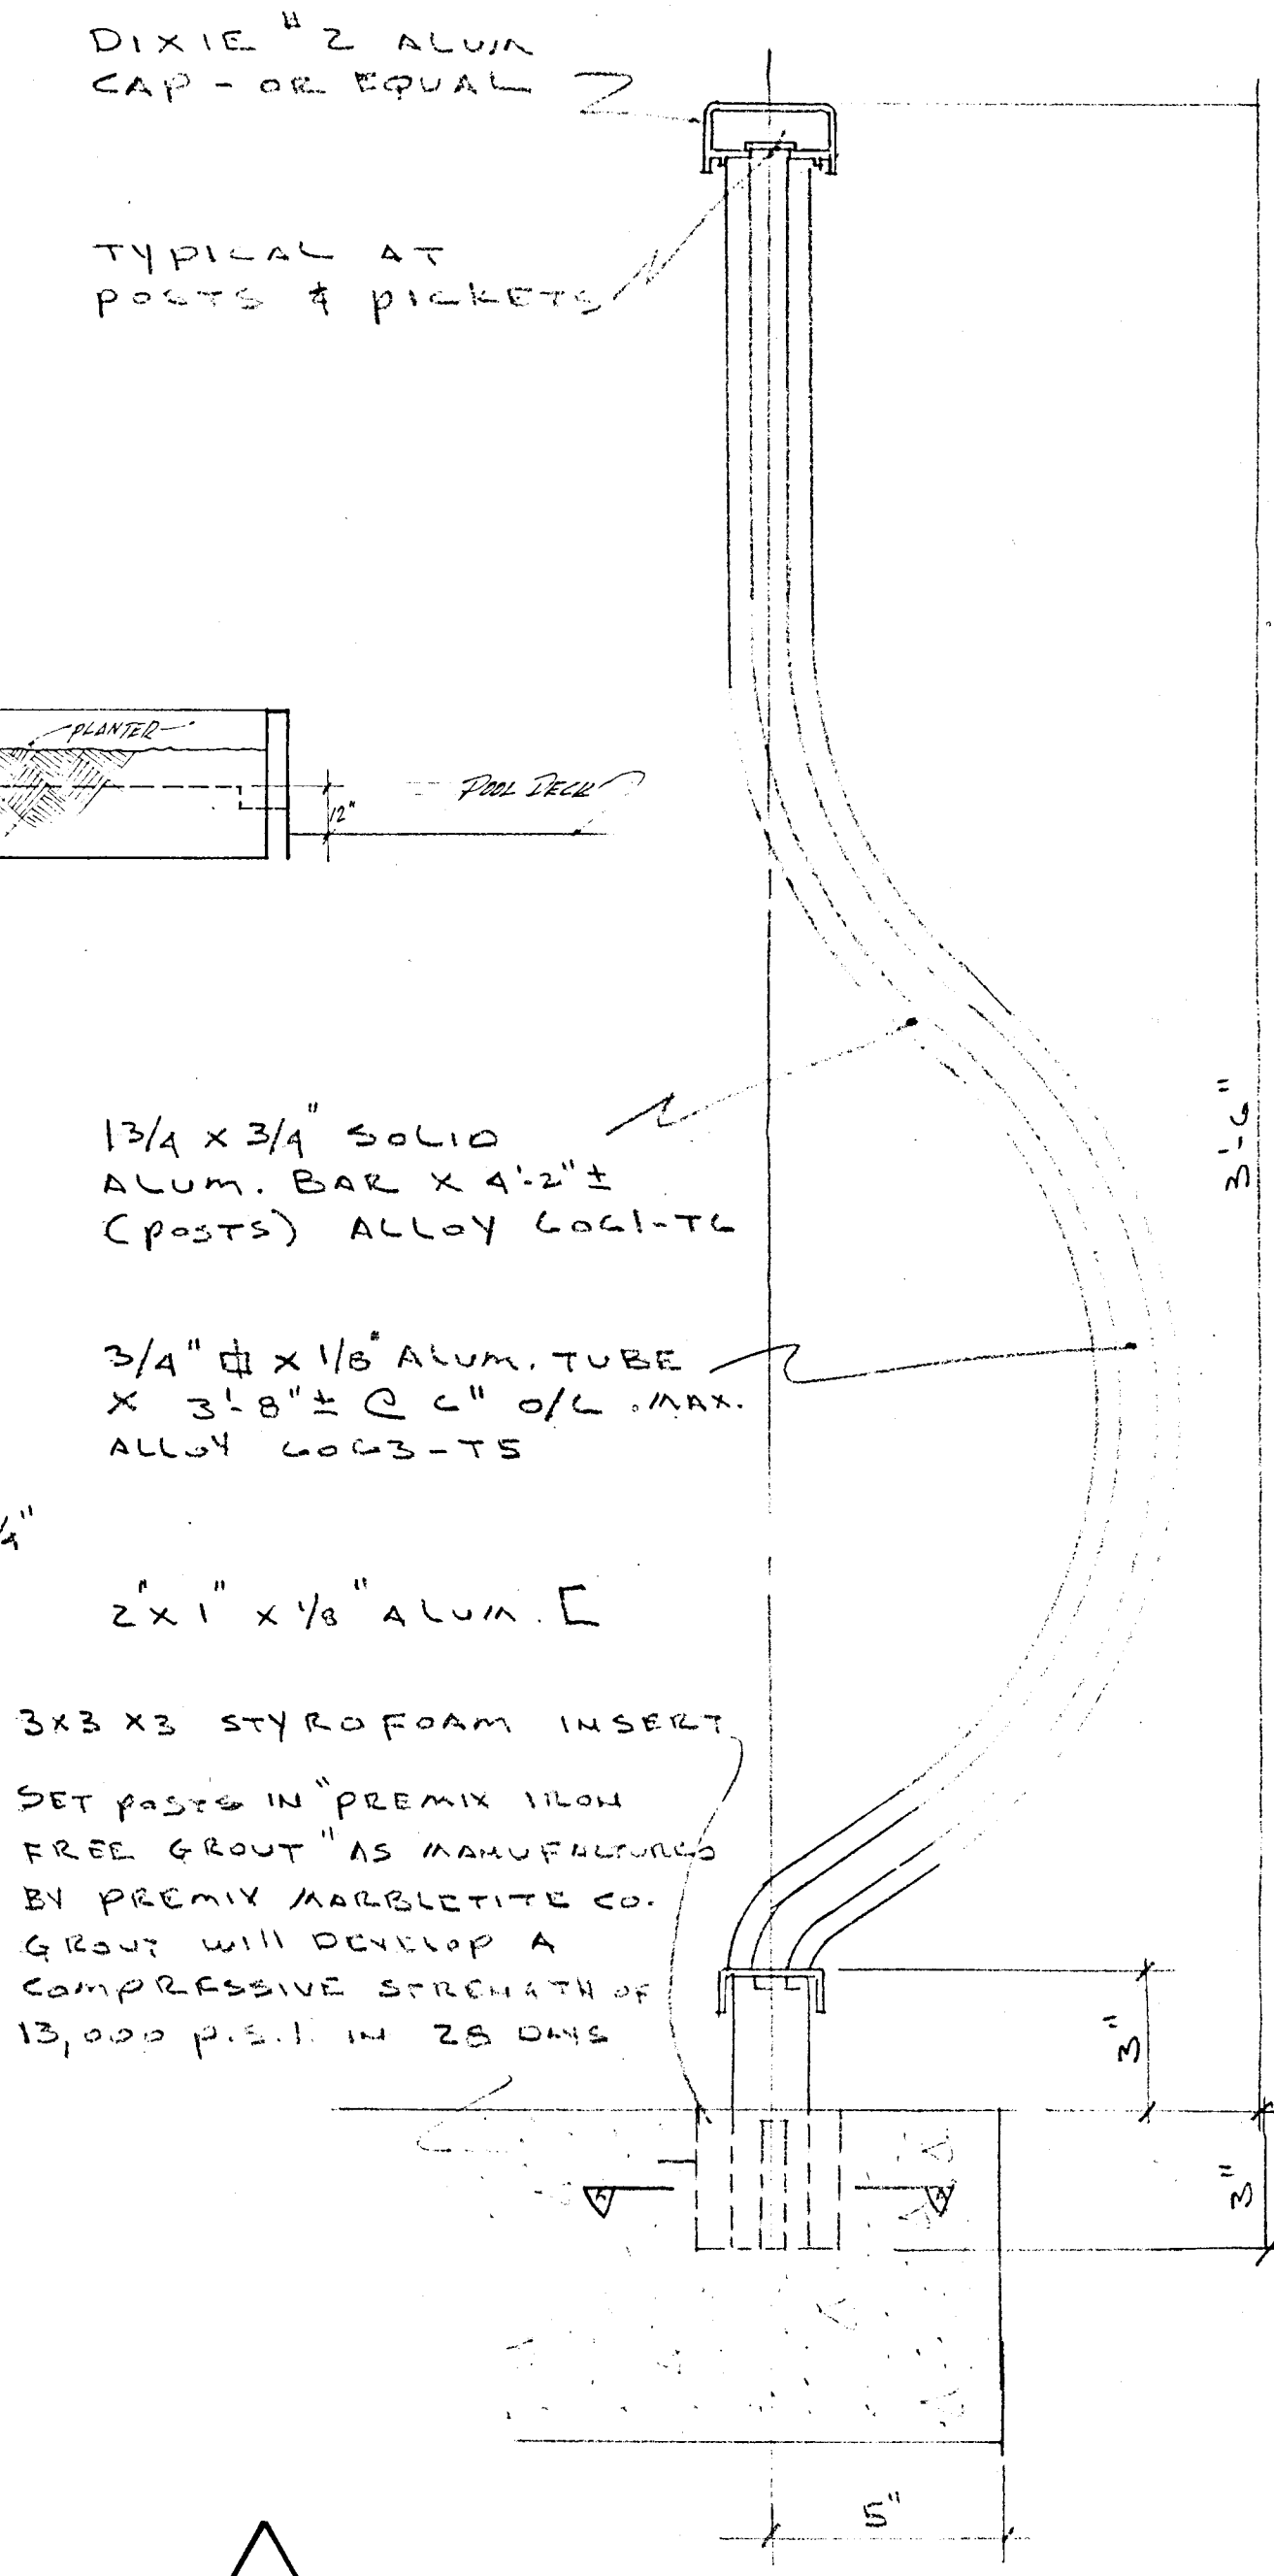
DETAIL ELEVATION (B) @ 1/4" = 1'-0"
